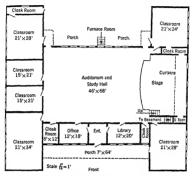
FIGURE III. FLOOR PLAN OF A CONSOLIDATED SCHOOL BUILDING, ROCKVALE, TENN.
